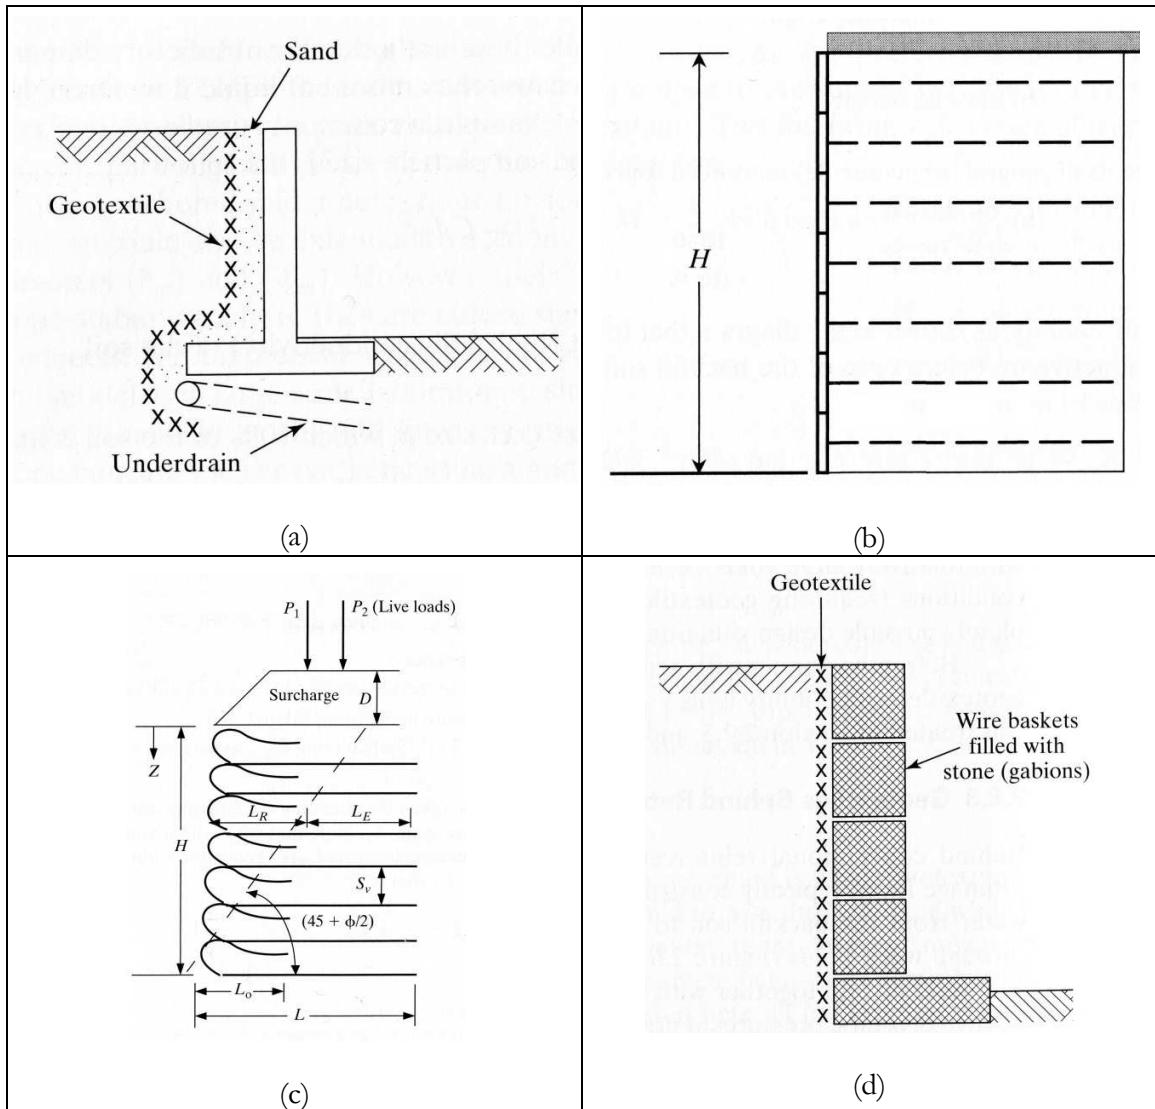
Retaining wall options using geosynthetics including (a) gravity retaining wall, (b) mechanically stabilized earth (MSE) wall, (c) geotextile wrap-around wall, and (d) gabion wall. *Note:* Adapted from *Designing with Geosynthetics*, fig. 2.62a, Example 3.10, fig. 2.45, & fig. 2.62d, by R. M. Koerner, 2005, Upper Saddle River, N.J.: Pearson/Prentice Hall.
